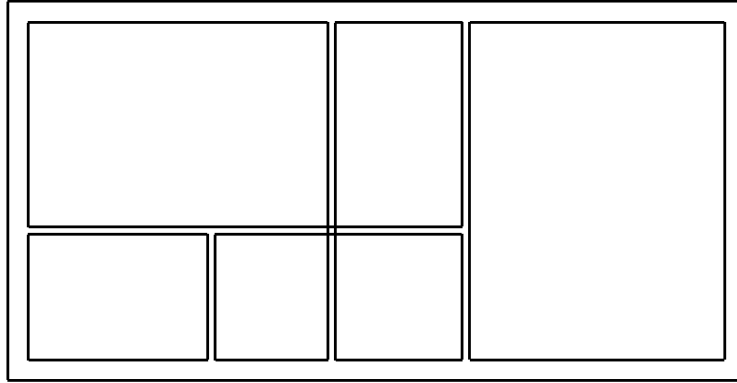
The complete building profile of the Apartment 1 project with the exterior and interior walls
